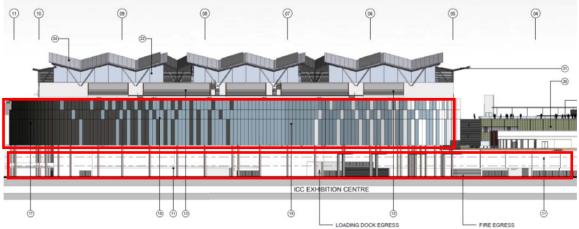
Area of roof and façade requiring richer features Source: Proponent SSD Application
